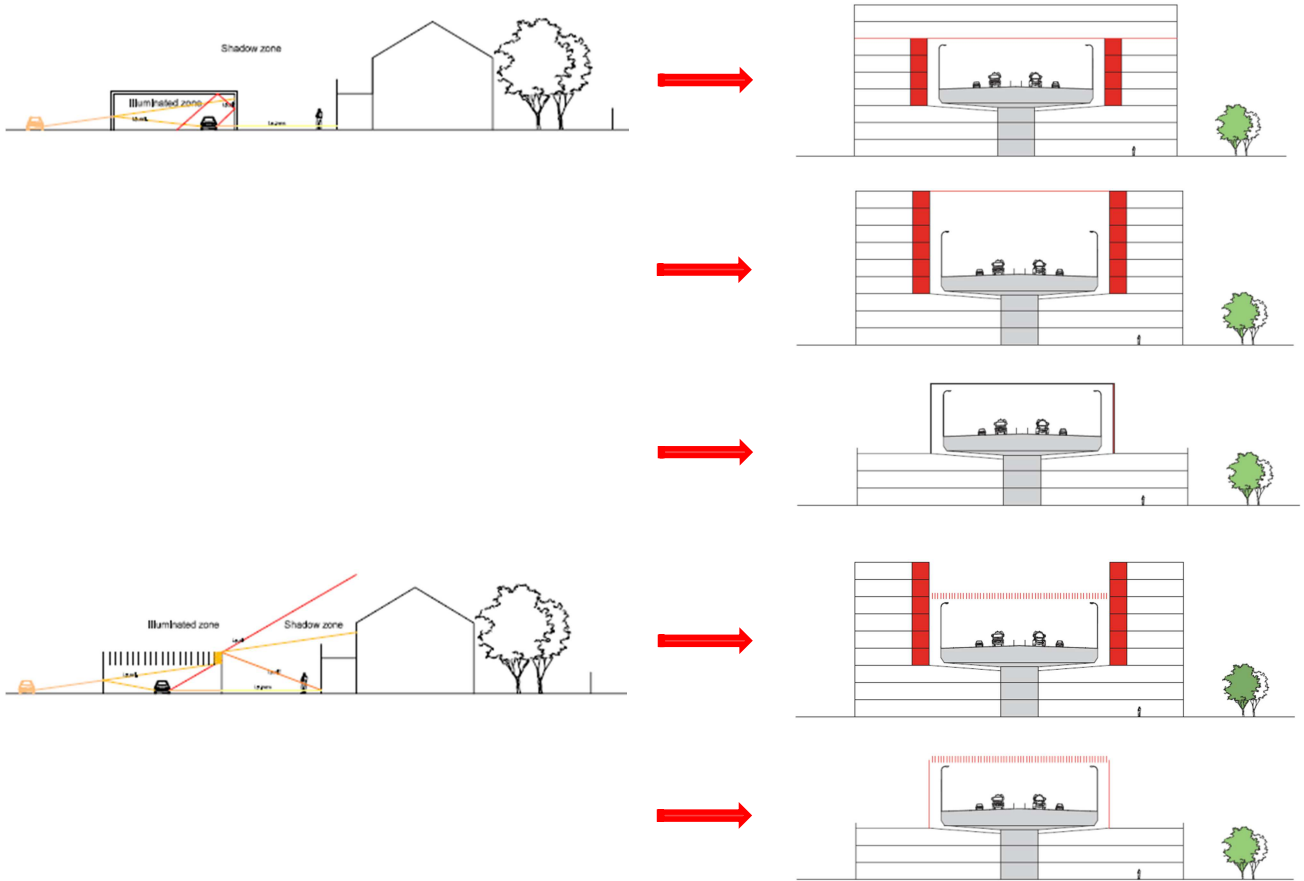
Tunnel principles translated to building design at the A5(Author,2013)
